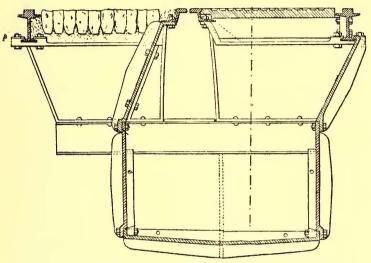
TRANSVERSE SECTION THROUGH PULLEY VAULT.
